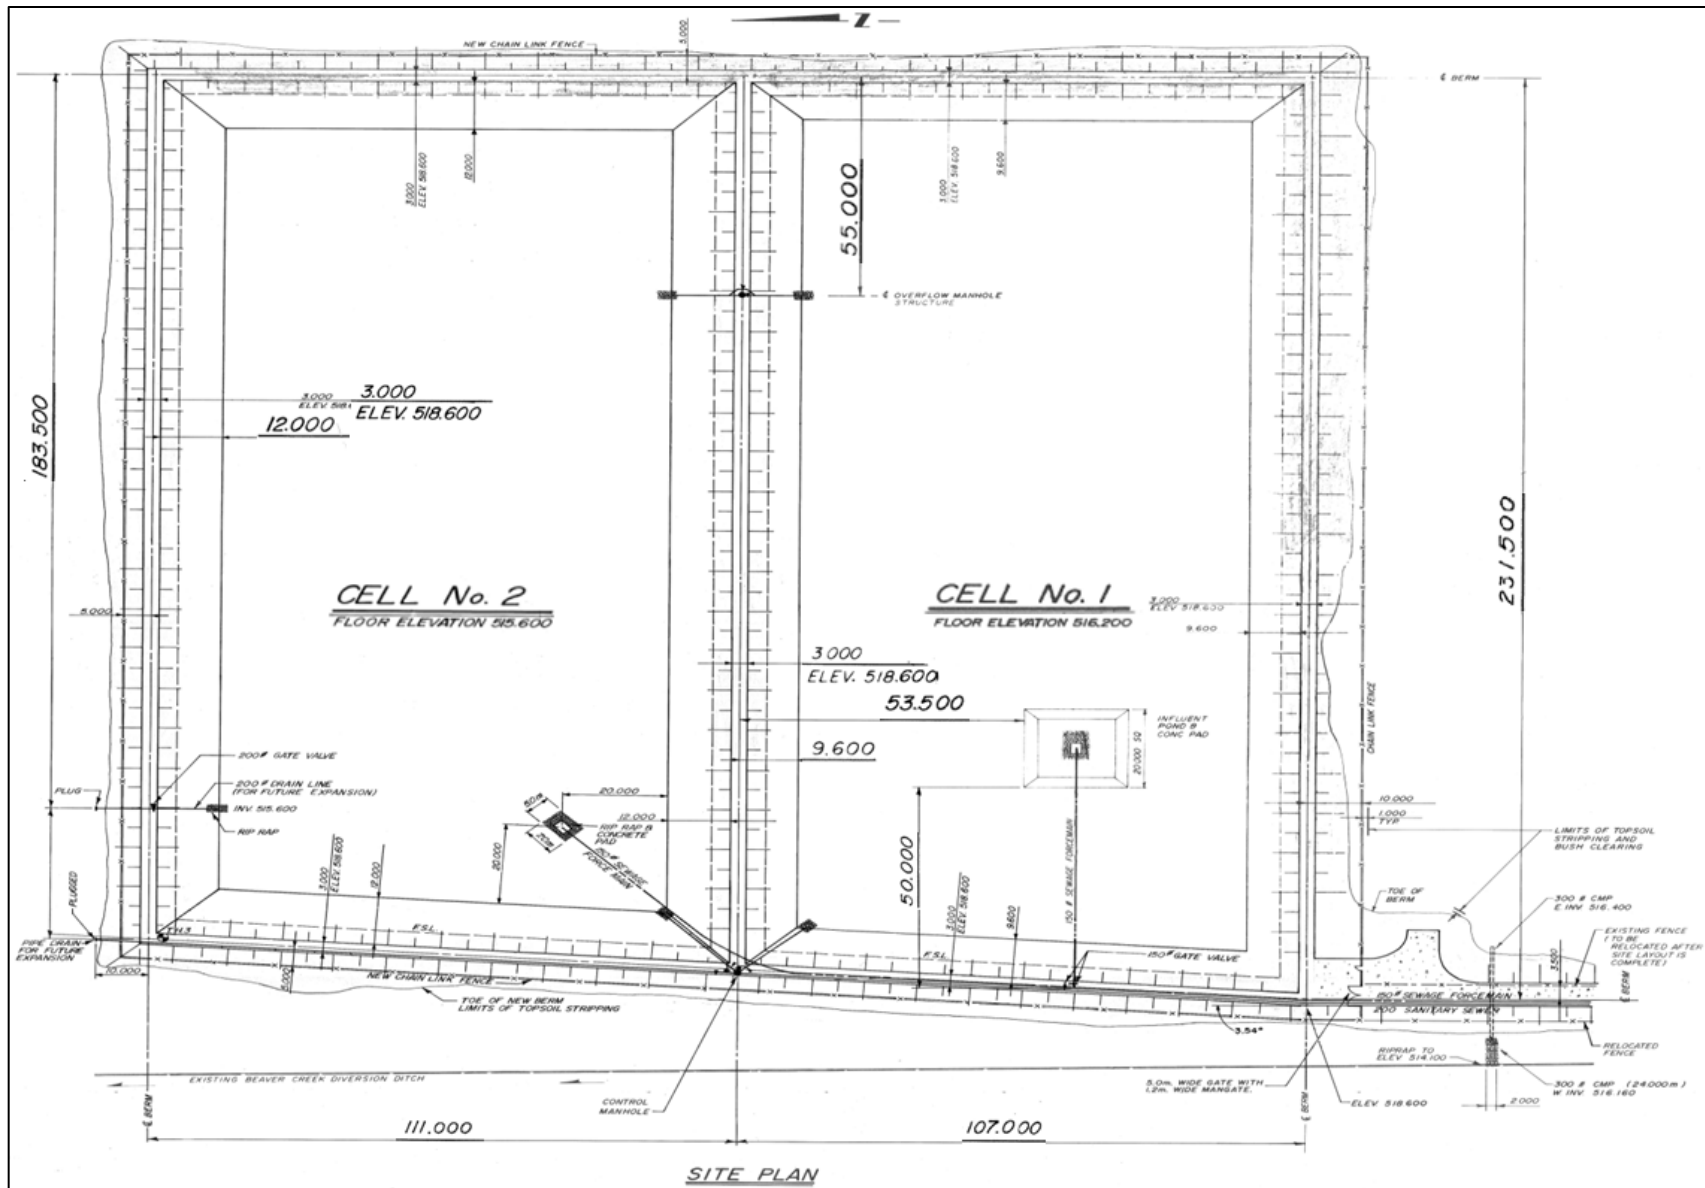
1988 Construction drawing - Site plan of lagoon cells area. Major dimensions have been enlarged. (Modified from Bullée Consulting Ltd. 1988)
